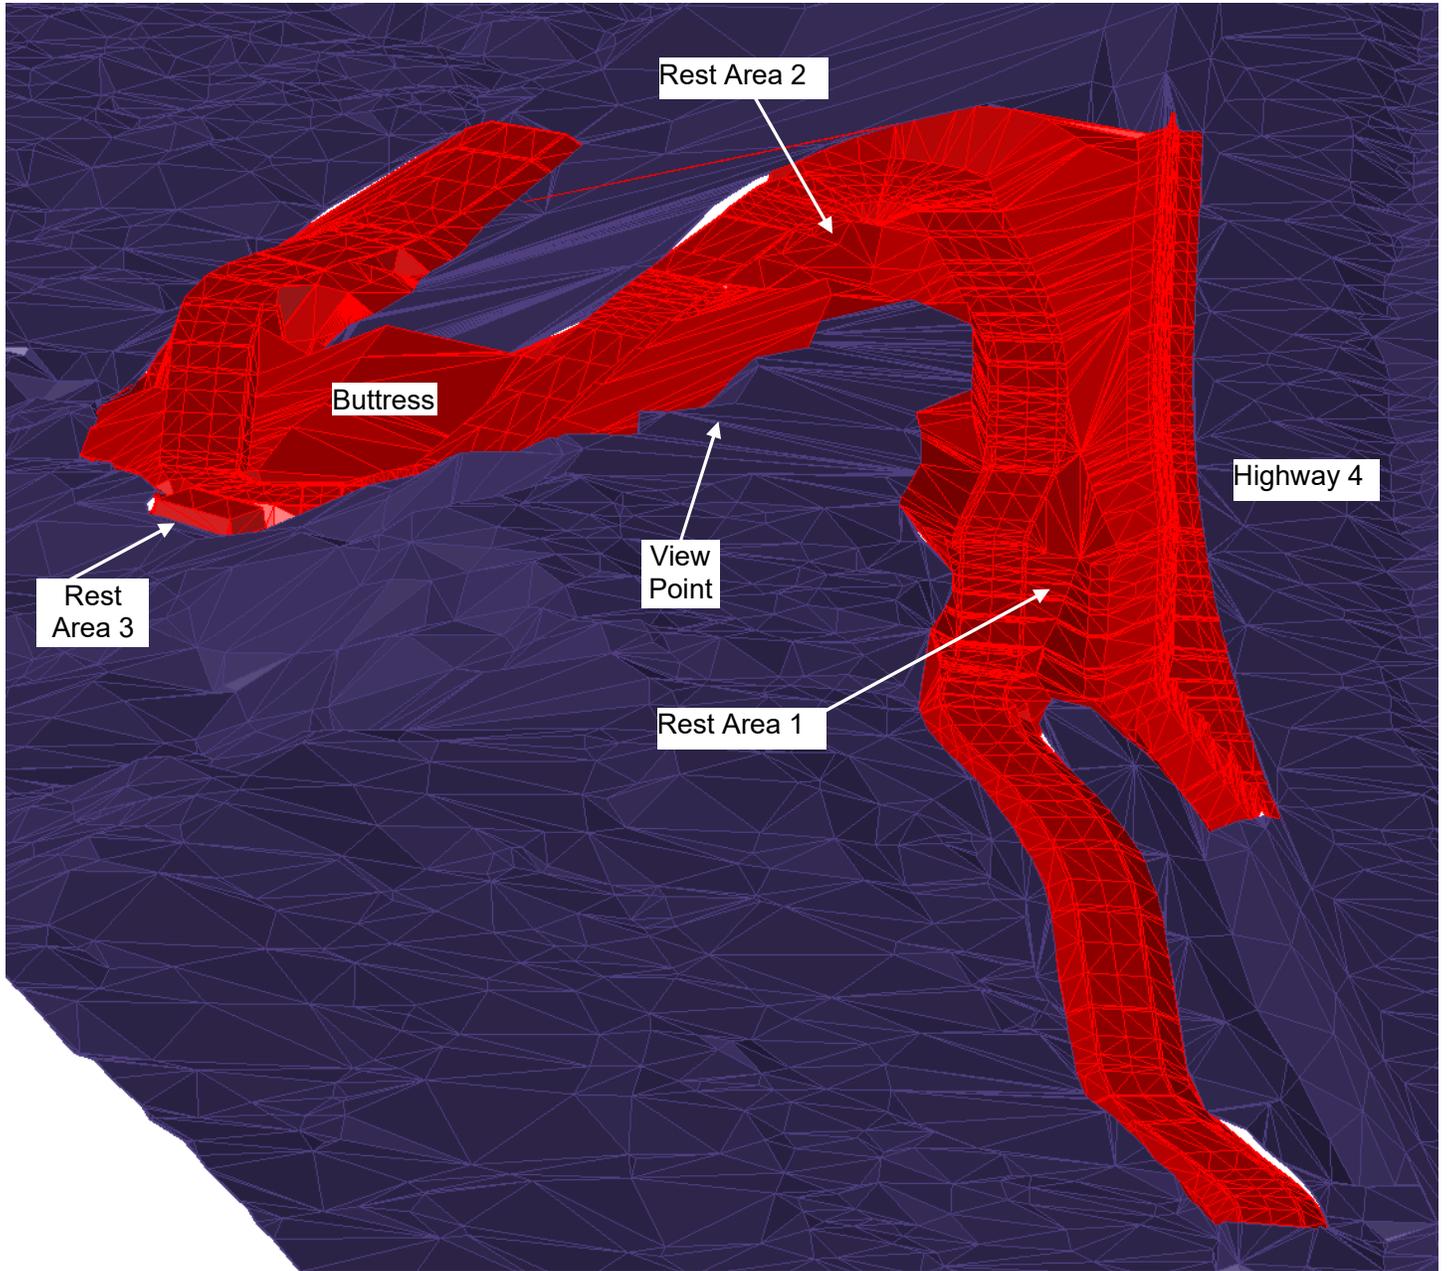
B 3D Rendering of proposed trail looking southwest from near highway elevation (from high to low) Image provided by Parsons.
